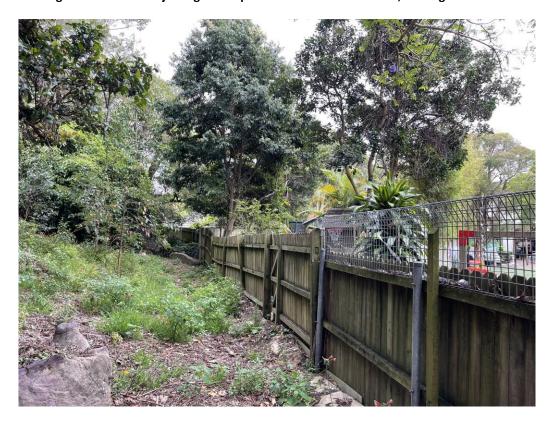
View looking towards the rear of the site, looking north-west from the public reserve to the rear of the site
